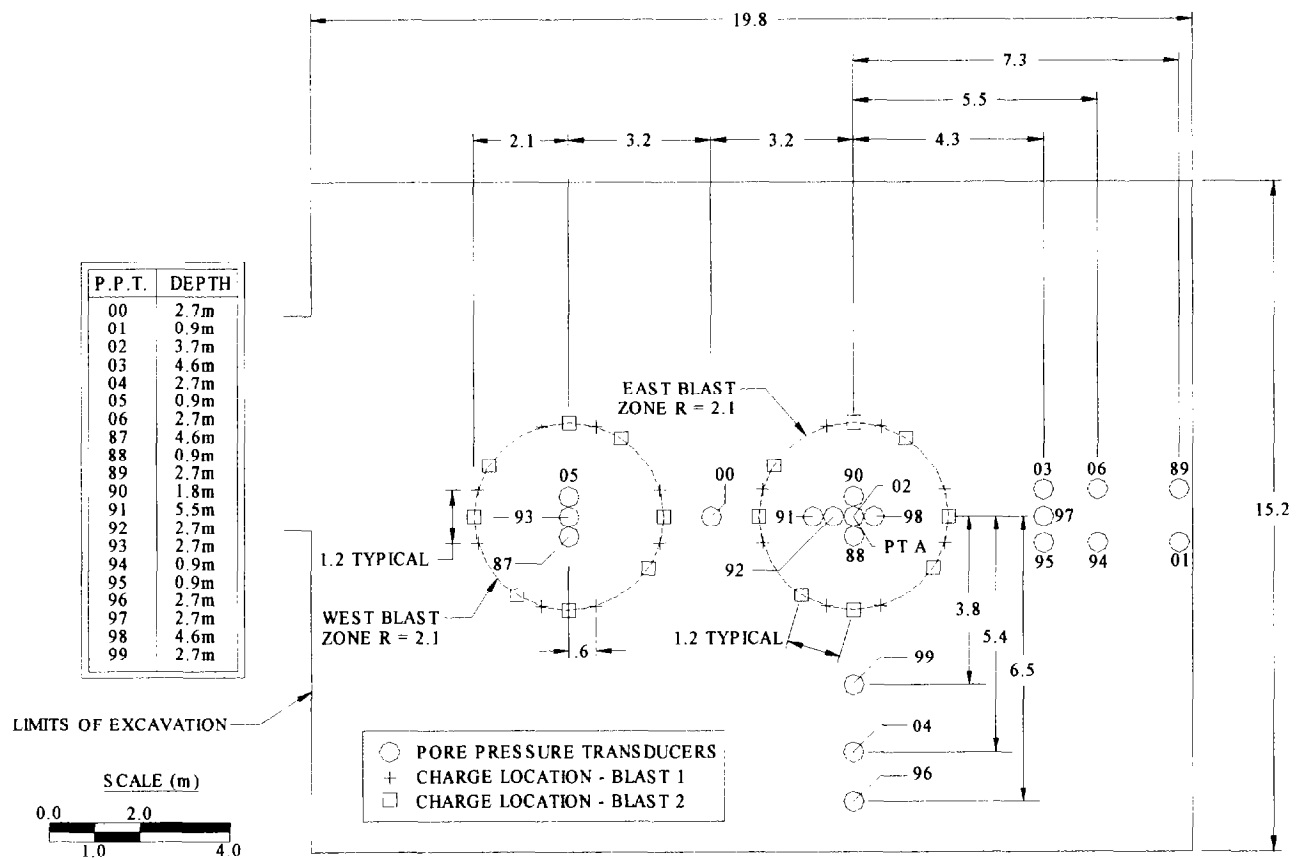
Layout of blast points and pore pressure transducers (PPT) at pilot liquefaction test site (depth below water table).
